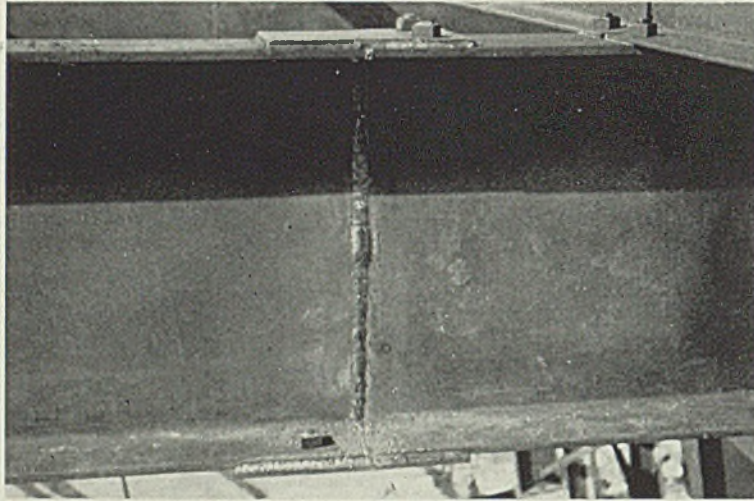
Field splices shown above occur at points of low stress. Note flange splice plates provide temporary support for erection of center section of the frame, as mentioned and shown diagrammatically in Fig. 2
